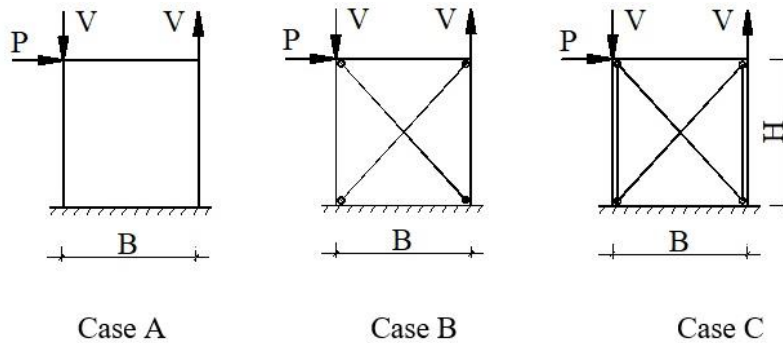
The equivalent model of the high masonry wall without braces and with braces.
